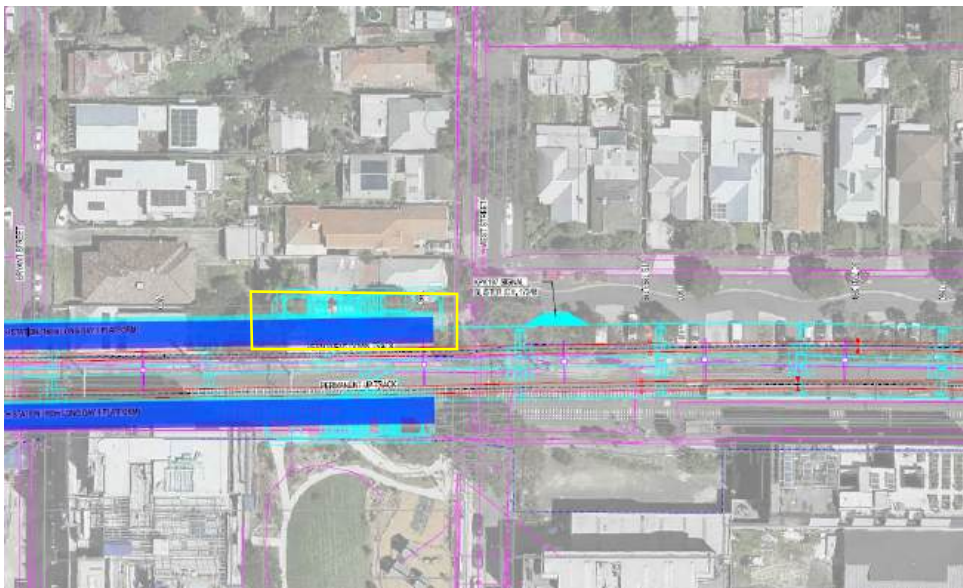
Extract of layout plan showing proposed new stair access to new elevation railway station, to be located at 13 Orient Grove (approximately indicated by yellow polygon). Note that north is to the right of the image. ('Brunswick EES Referral Boundary' Mapbooks (RevM))
